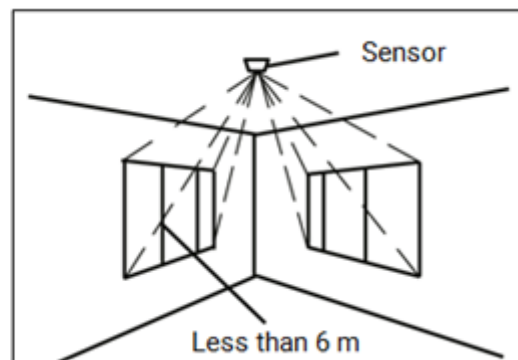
Installation of the sensor on the ceiling for protection of glass areas on sharing walls
